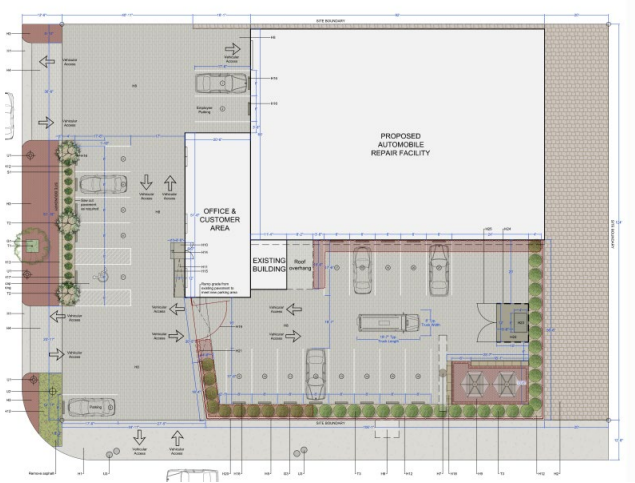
Aerial view of the proposed landscaping around the site and planned exterior hardscaping.
